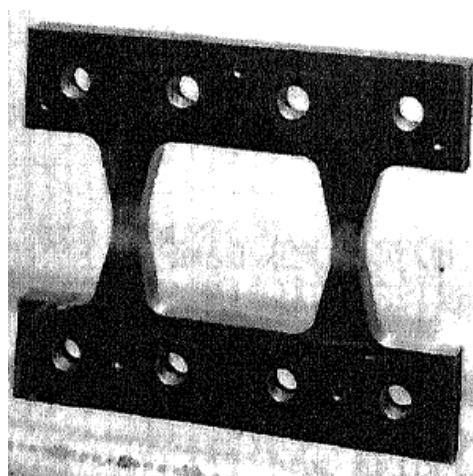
Steel plate with butterfly-shaped links (From [18])
